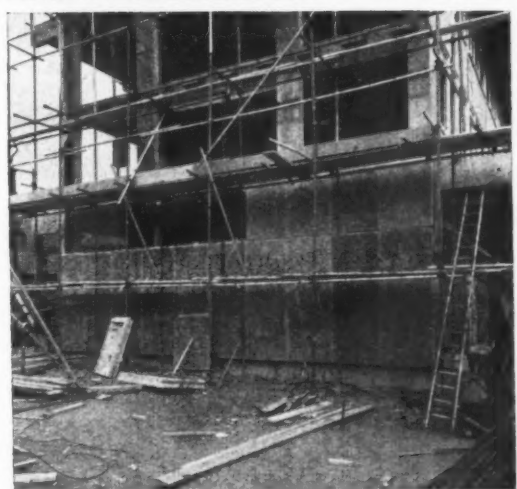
(top). Cladding slabs for gable ends stacked on the site. The stiffening ribs on the back are shaped to reduce risk of cracking and to minimise dripping and splashing of any moisture which may find its way in. Fig. 17 (above). Cladding slabs being fixed to gable wall.
